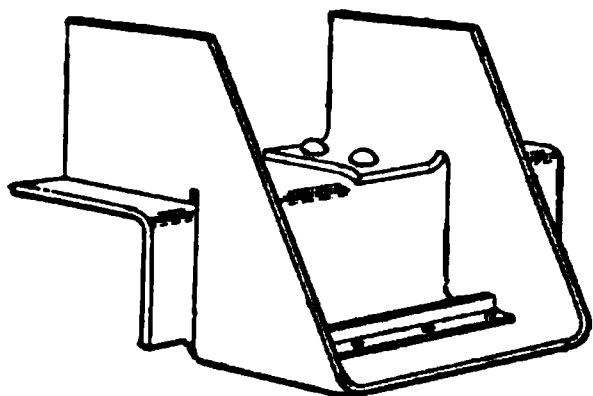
Duplex Wall-hanger for Large Wooden Girder
